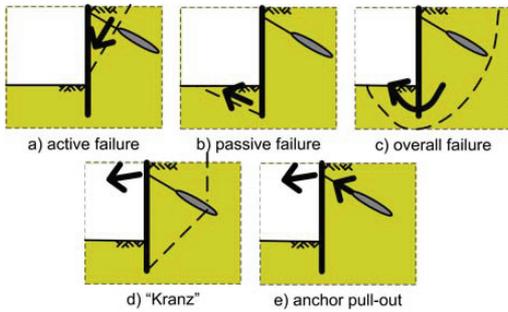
Soil Shear Failure Mechanisms in Retaining Walls.
